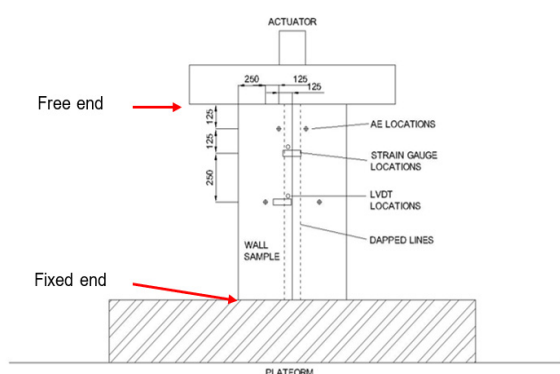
Schematic diagram of the wall-to-wall connection setup with other instruments (units in mm)
